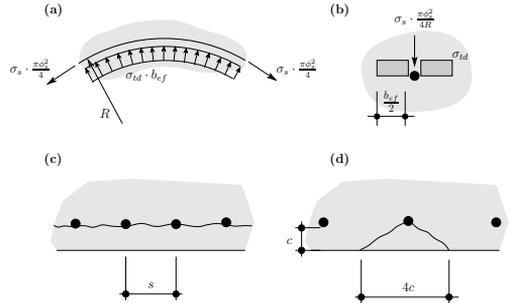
Spalling of concrete cover: (a) equilibrium of deviation forces of a curved reinforcement; (b) tensile stresses due to deviation forces (assuming a constant tensile stress in concrete); (c) global spalling of concrete cover; and (d) local spalling of concrete cover.
